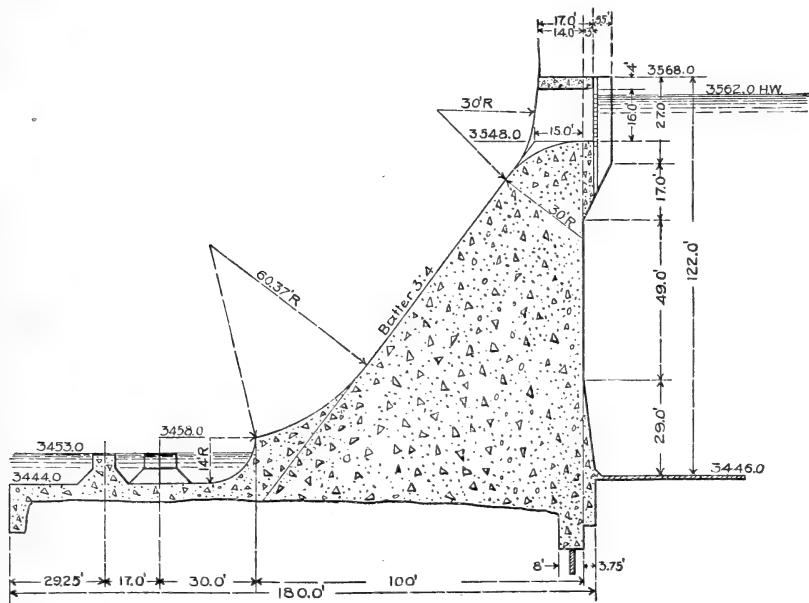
Holtier dam of the Montana Power Co. Cross section of spillway of development near Helena, Mont. Shows baffles at toe of dam to neutralize the energy developed by the water pouring over the crest.
